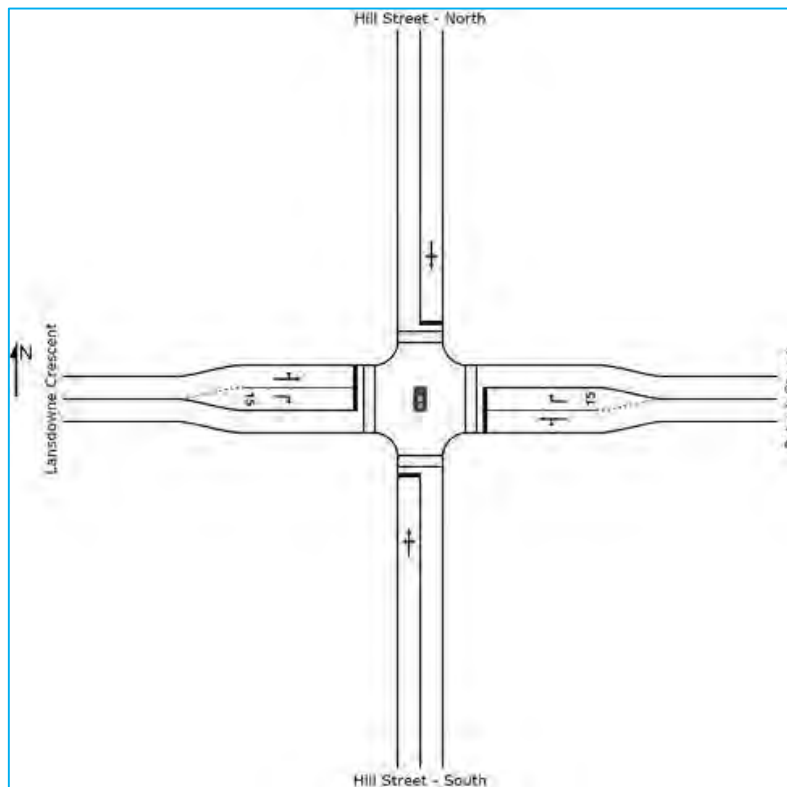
Lansdowne Crescent, Hill Street and Patrick Street Signal Phasing
